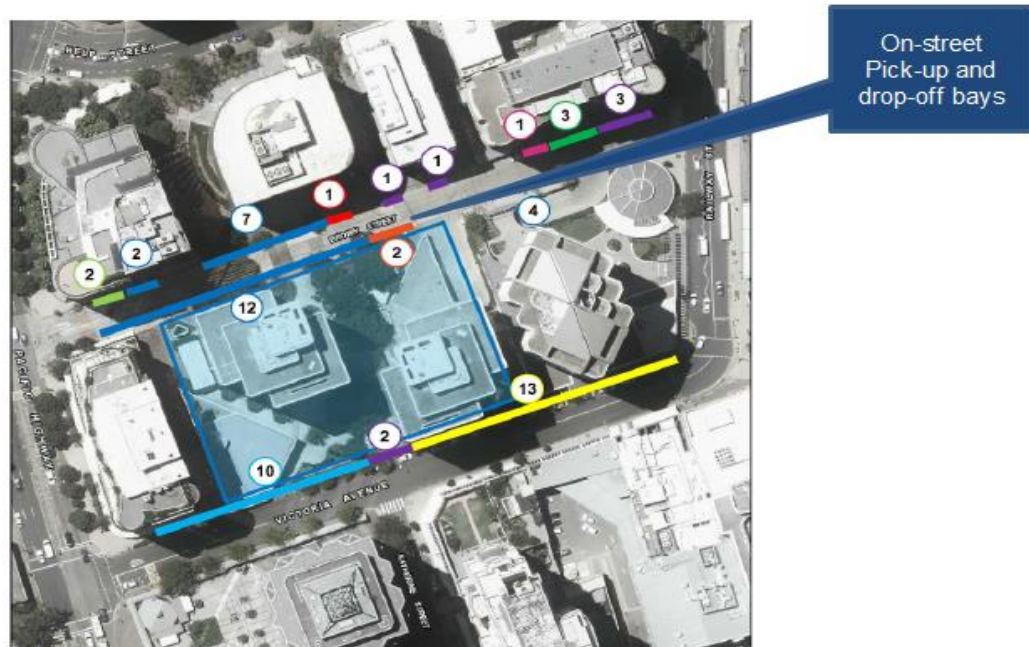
On-street pick-up and drop-off bays (Source: Traffic and Transport Assessment by Arup)
